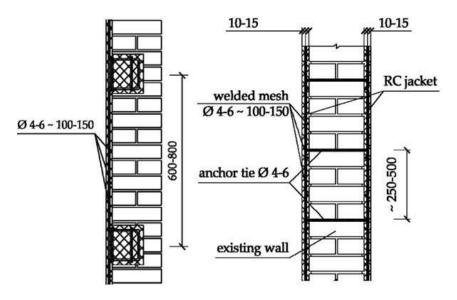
Strengthening of Masonry Walls by Application of Single and Double sided reinforced concrete (RC) jackets
